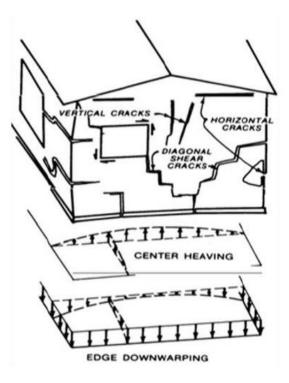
Cracking patterns developed on walls due to soil heaving (Delandro & Wickham, 1983).
